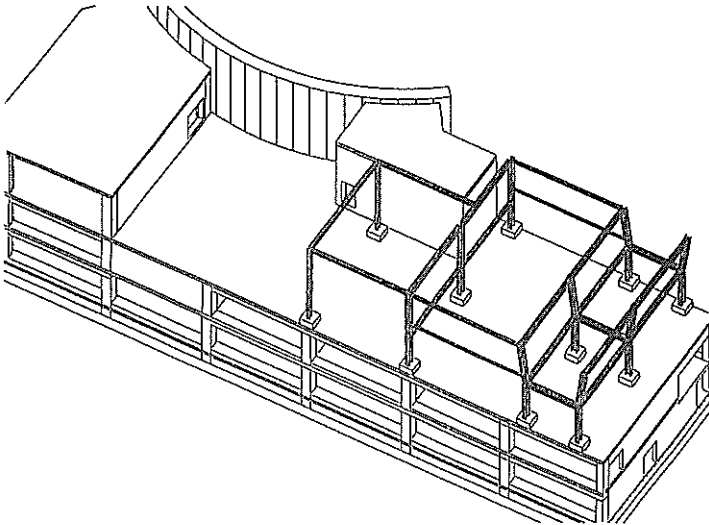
Steel structure on the intermediate building, supporting the MSL and FWL piping
